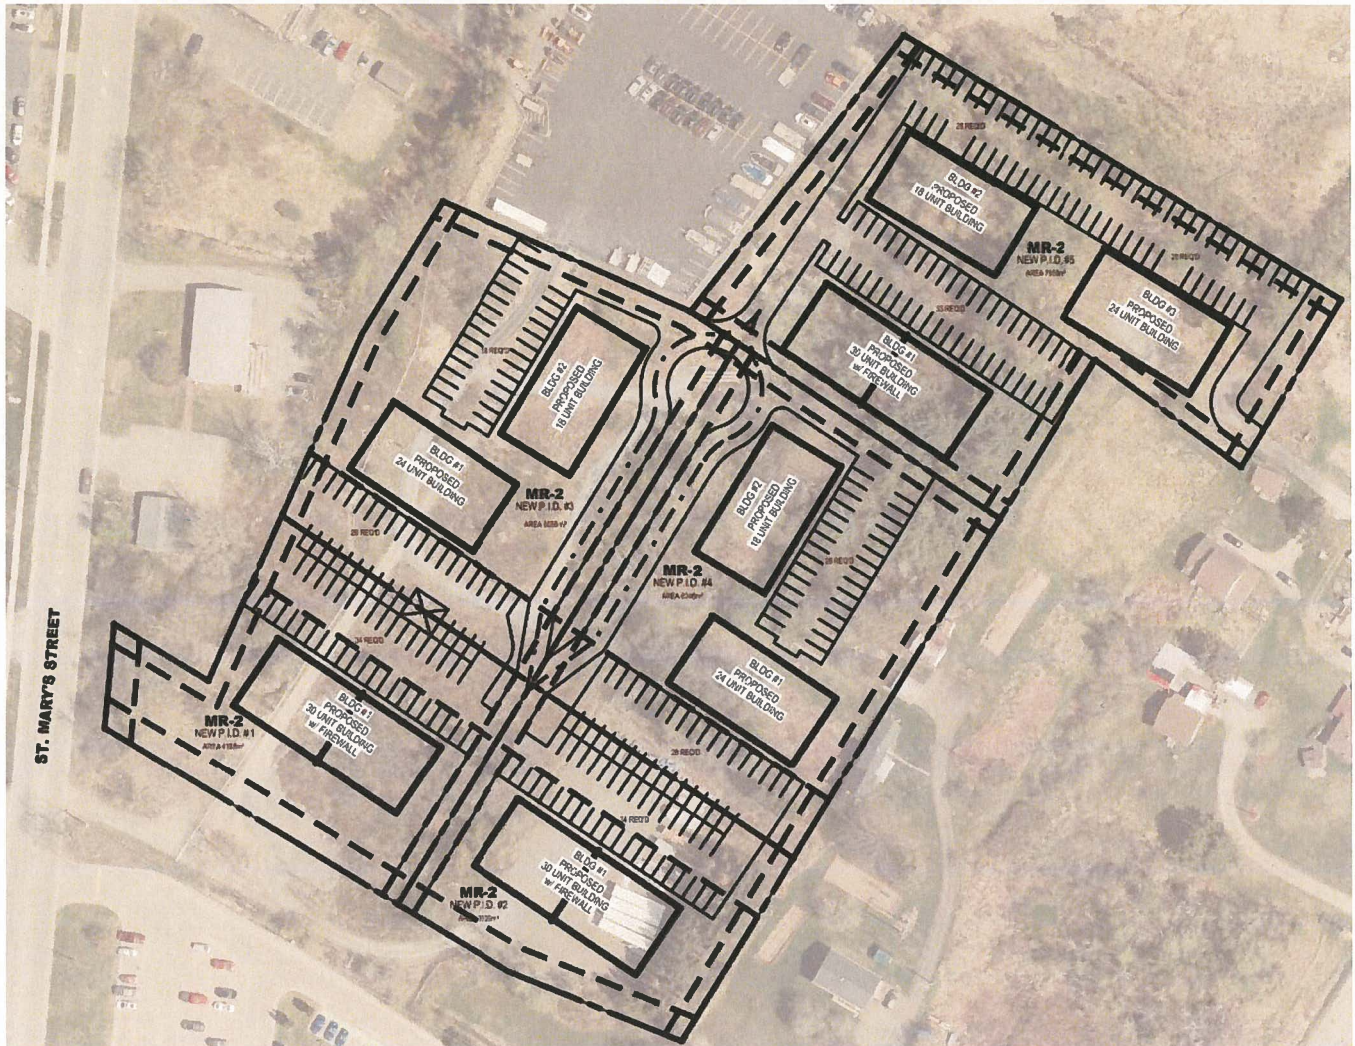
Proposed Site Plan (Image Courtesy of Advanced CAD Services Inc.)
